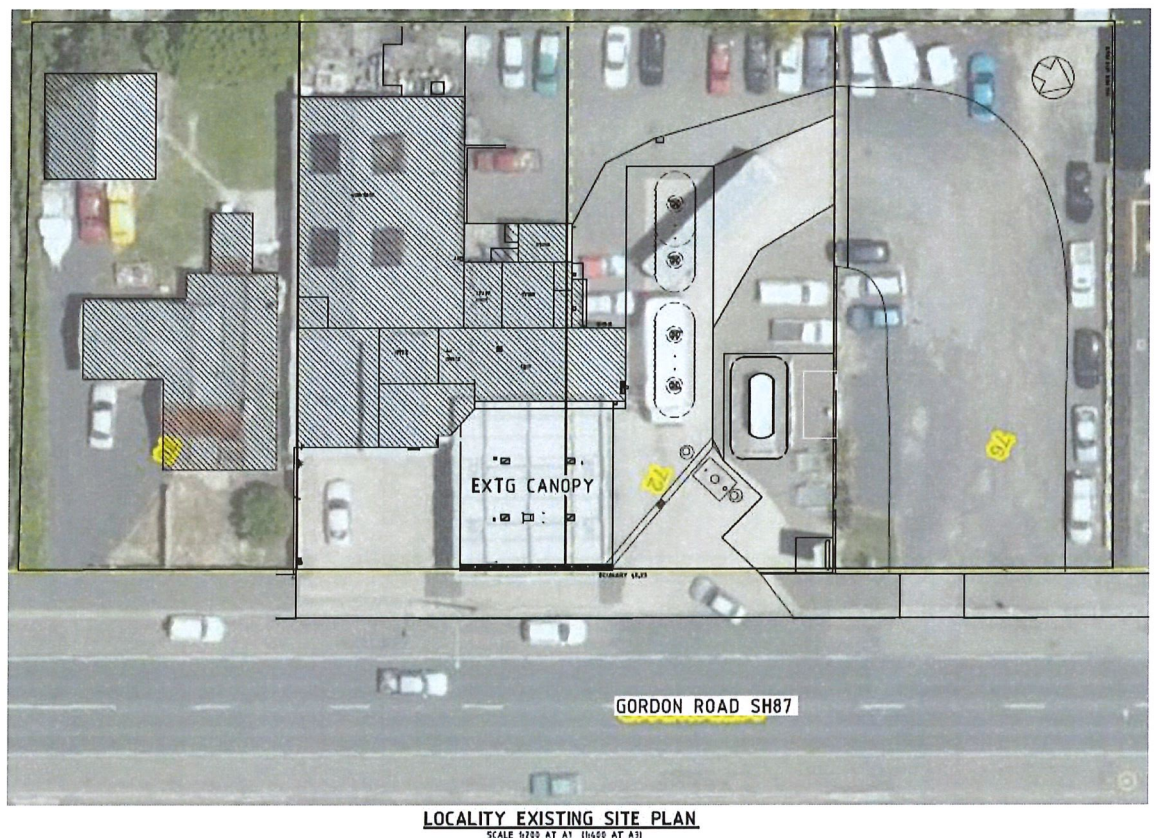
Plan showing existing site development of land at 70-76 Gordon Road, prior to the application.
